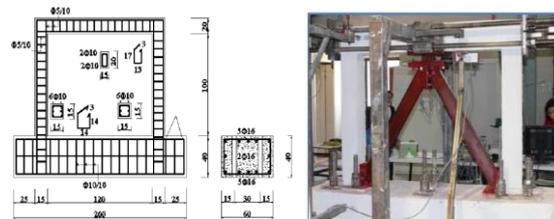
Details of reinforced concrete frame and experimental setup [24]
